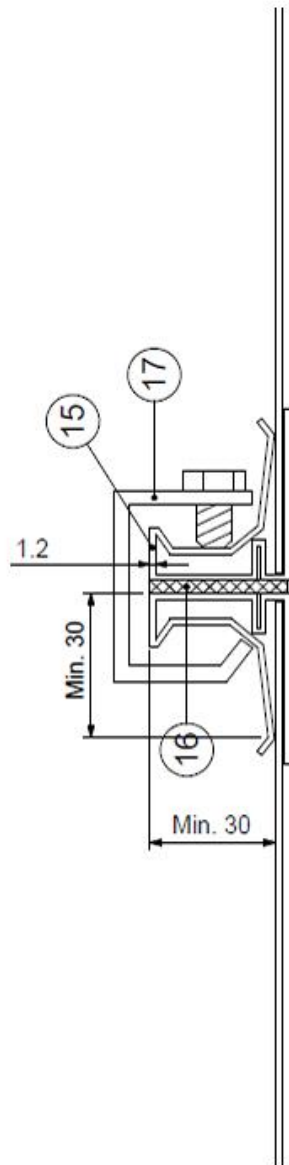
Installation of duct joint, location of the fasteners, technical drawing of principle
